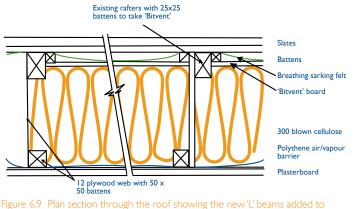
Plan section through the roof showing the new 'L' beams added to existing roof structure
